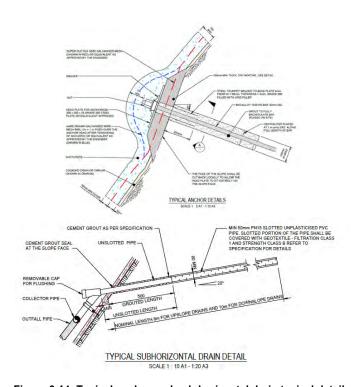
Typical anchor and sub-horizontal drain typical details
